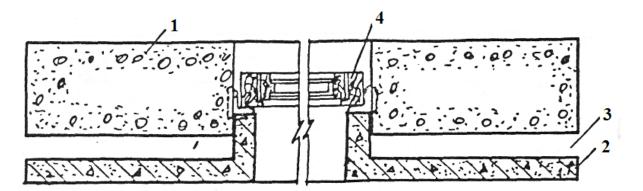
The design of the wall proposed by G.I. Bazylenko:
